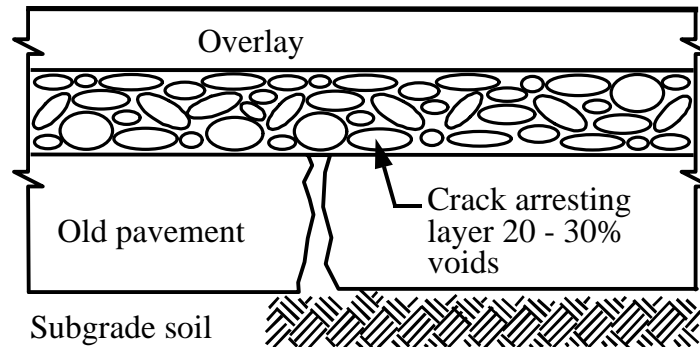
Cross section of a typical crack-arresting interlayer.
